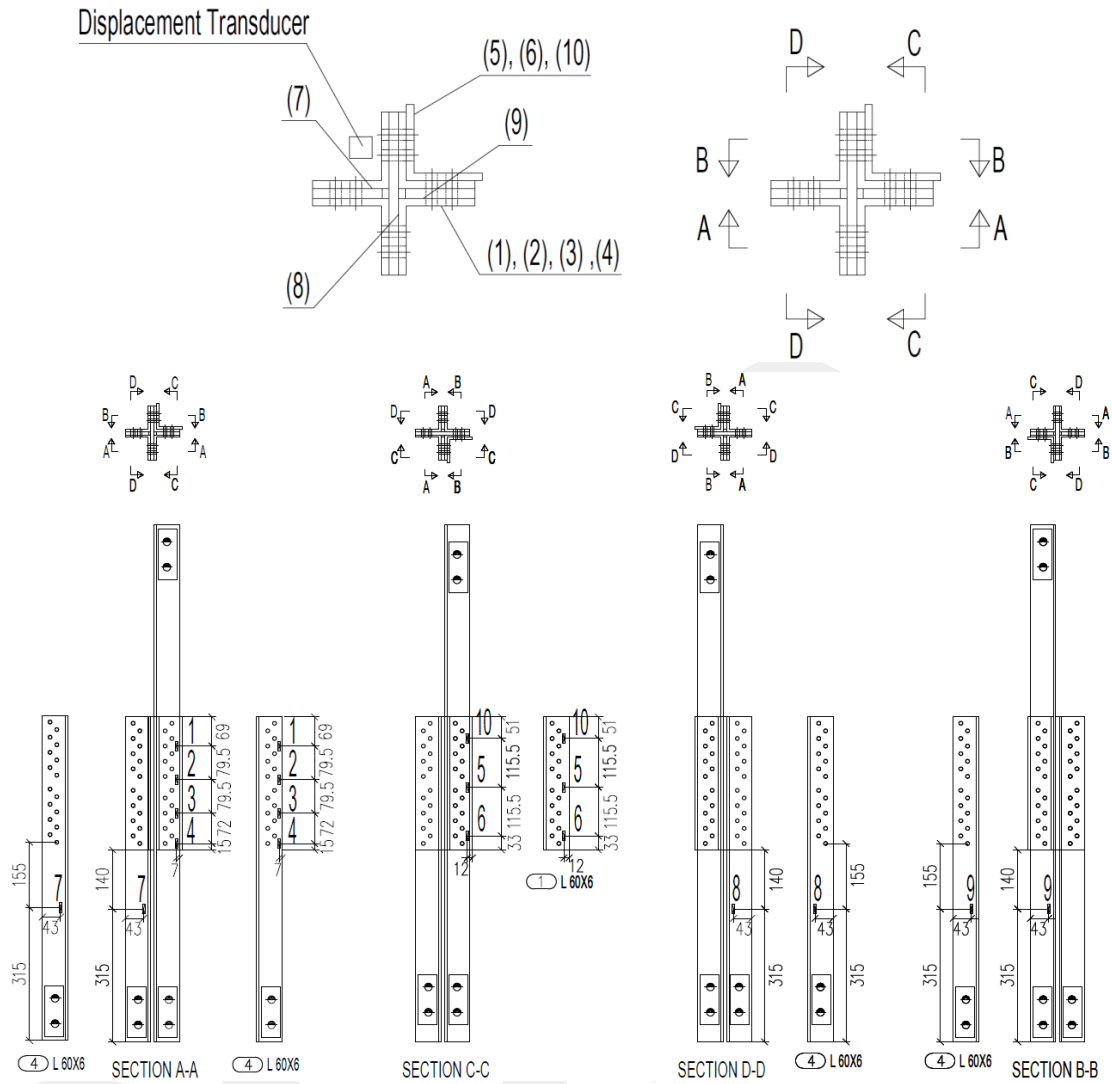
Strain gage and displacement transducer locations in side and cross-sectional view of Specimen-1 (dimensions in mm unit)
